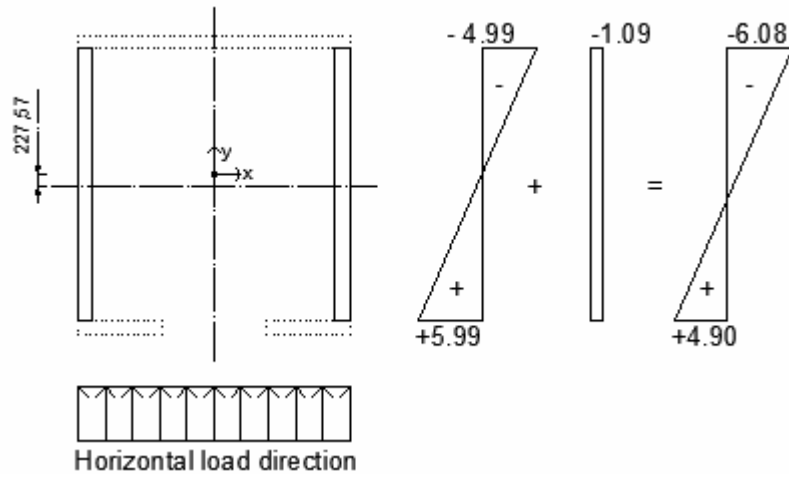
Stress distribution in walls 2/4, accounting for the governing load situation
